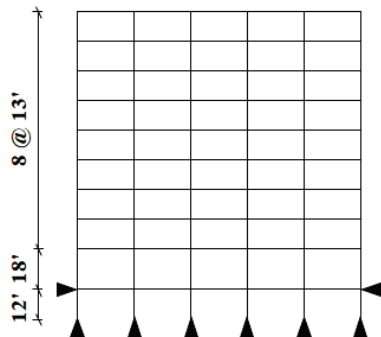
Baseline SDC D_{max} steel moment frame building typical 9-story elevation.
